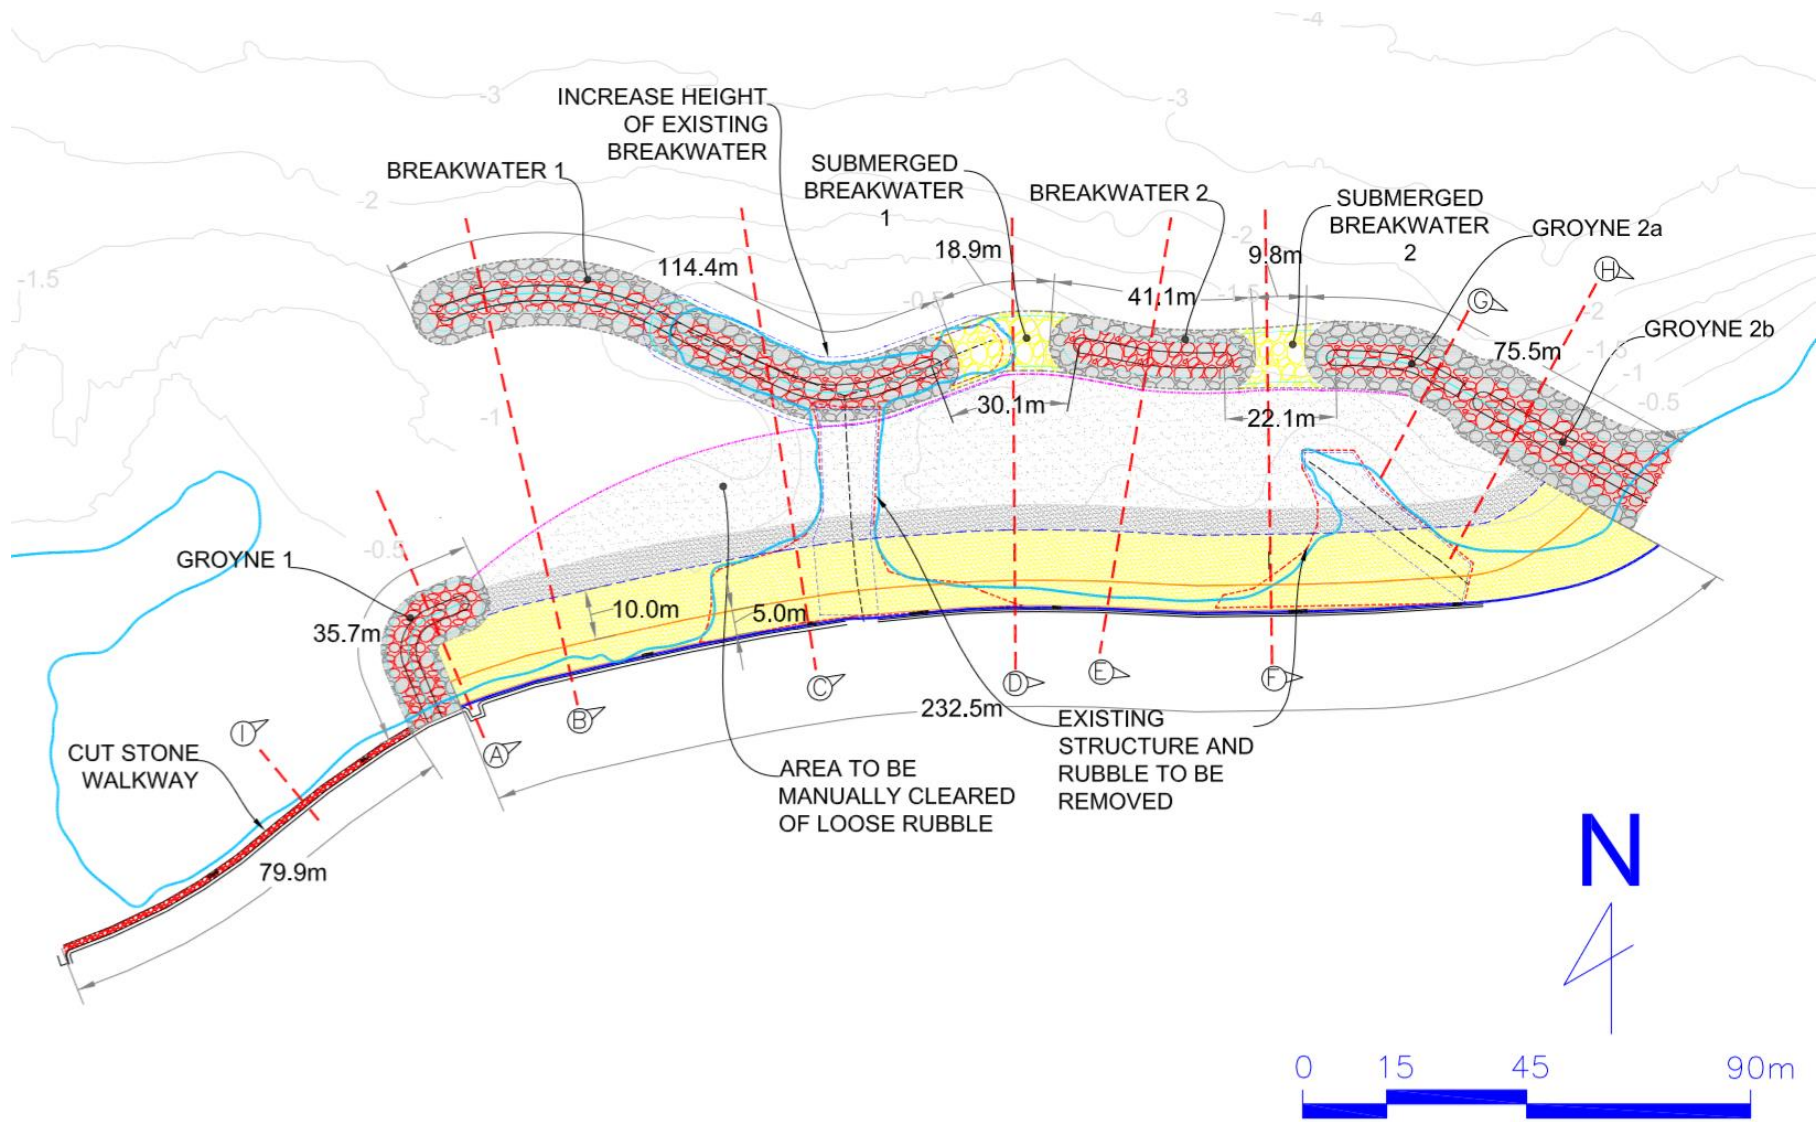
Plan of proposed structure layout including cut lines where cross-sections were drawn
